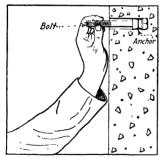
Inserting bolt and first unit of anchor shown in Fig. 108 in the hole. (Cinch Anchors, National Lead Co., New York City.)
